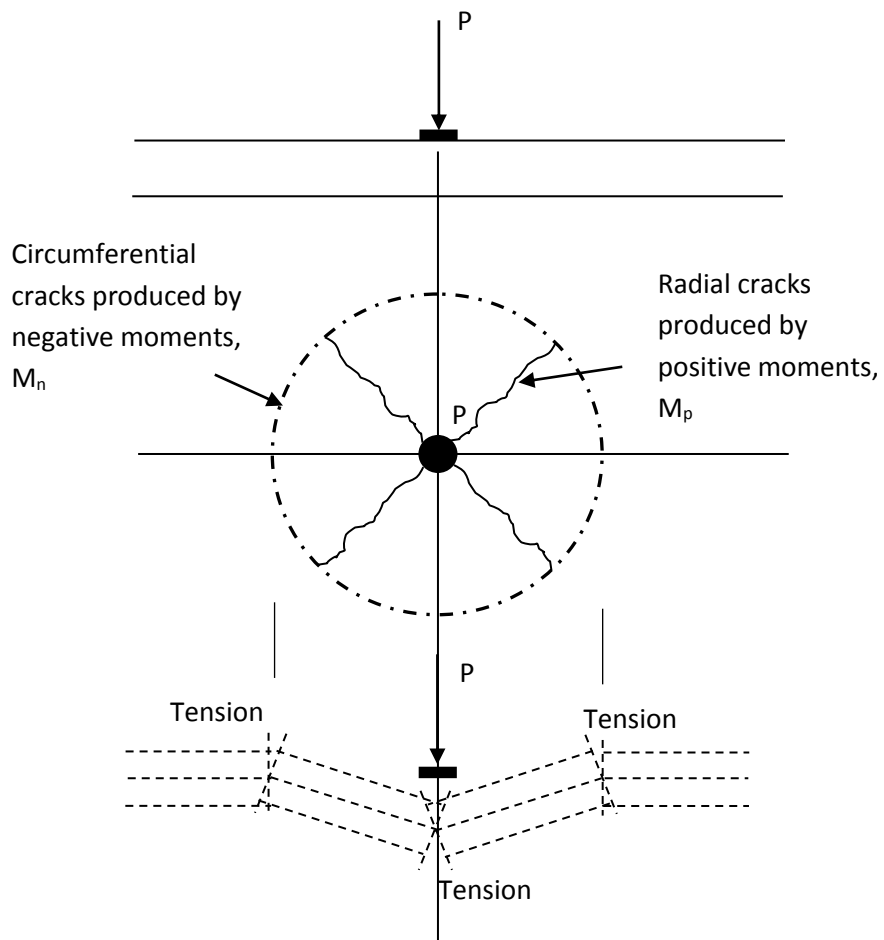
Development of radial and circumferential cracks in a concrete ground-supported slab (after TR34, 4thEd, Figure 7.2)
